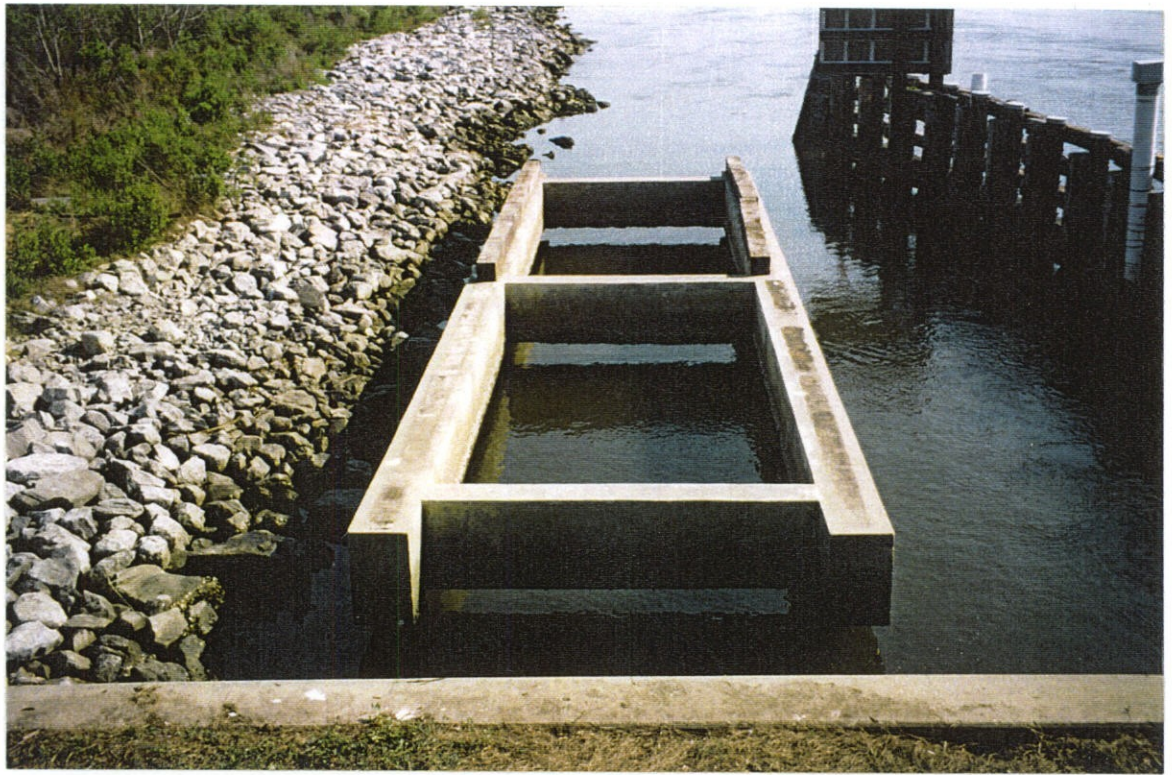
STORAGE RACK FOR DEWATERING ELEMENTS.
